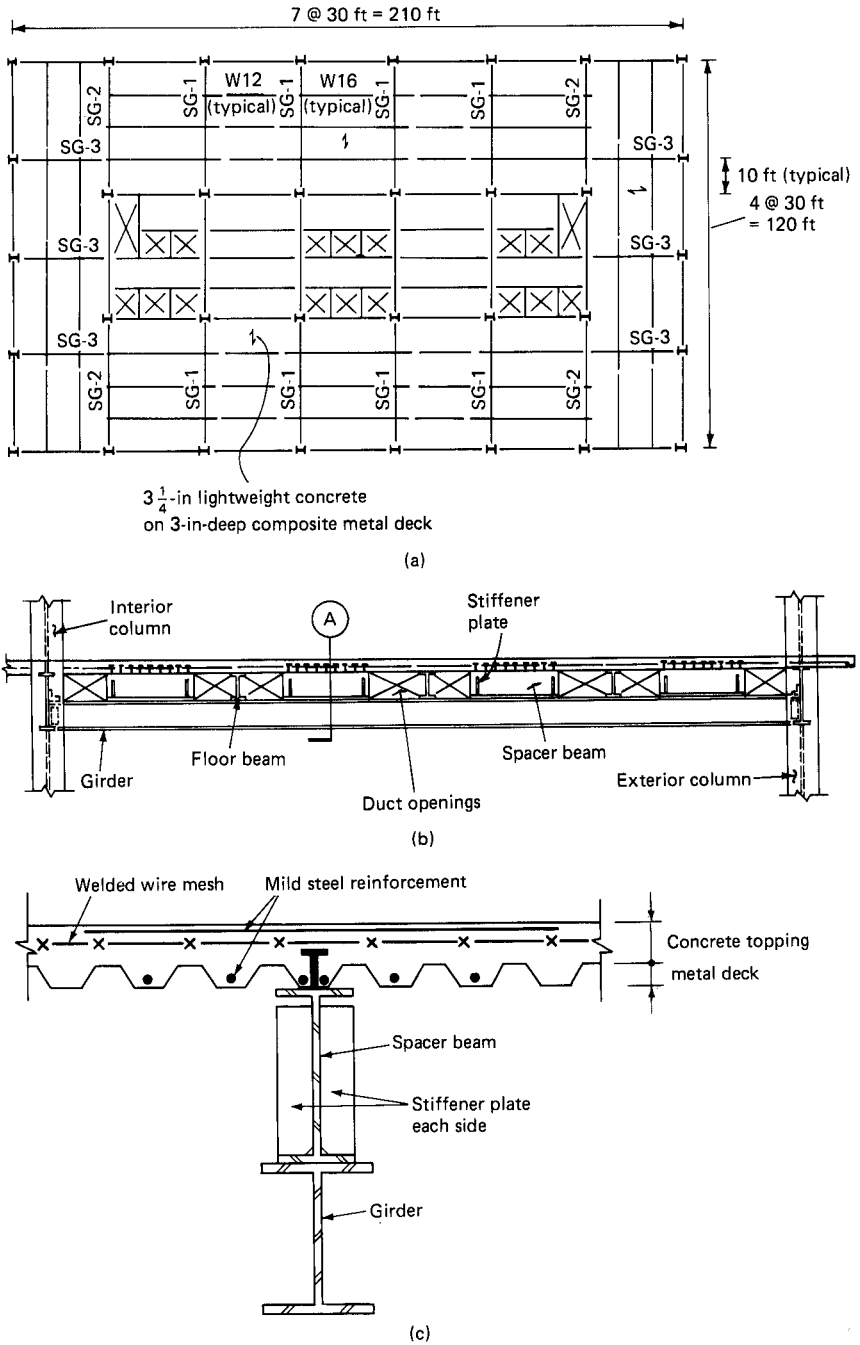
Stub girder framing (a) framing plan; (b) elevation of stub girder SG-1; (c) section A through stub girder.
